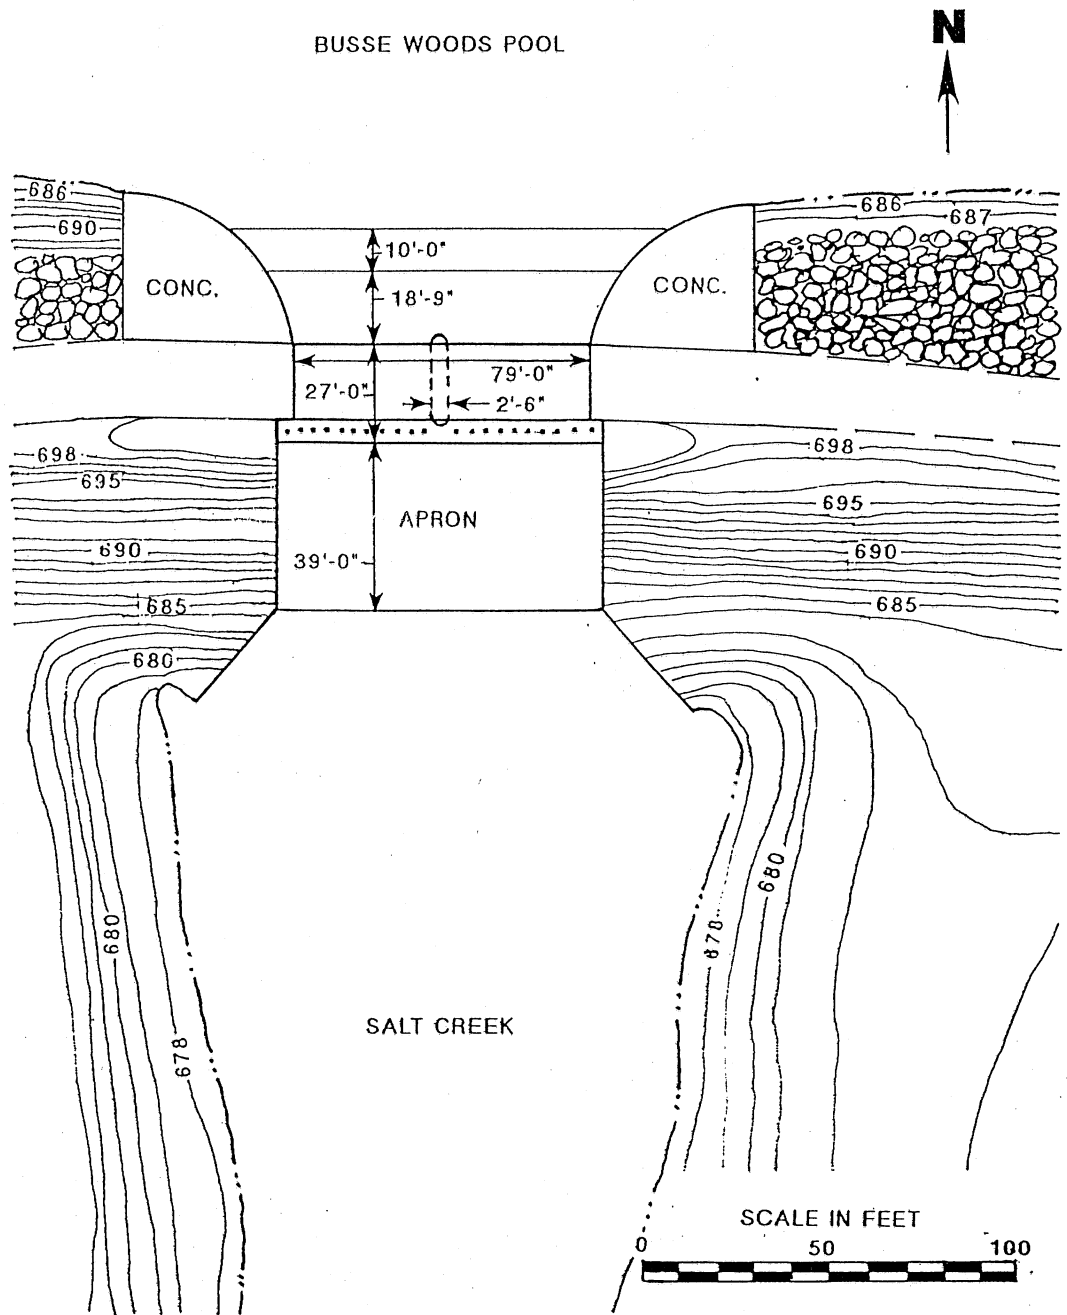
Detail sketch of Busse Woods Reservoir Drop Structure and Vicinity
